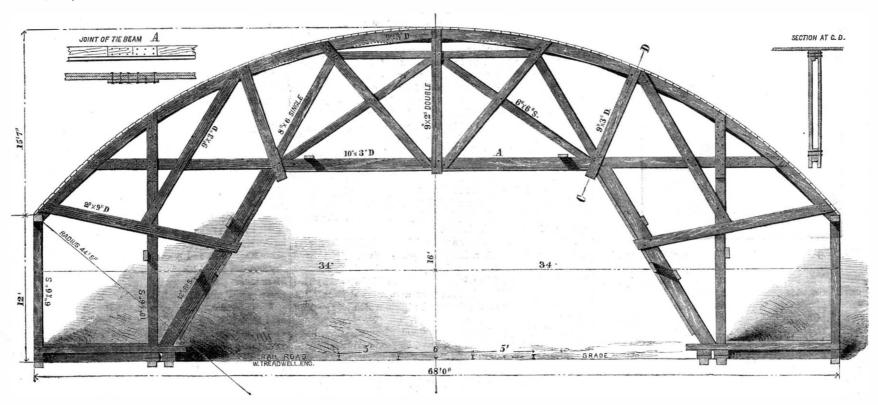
THE UNDERGROUND RAILWAY IN NEW YORK.—CENTERING OF THE GREAT ARCH, FOURTH AVENUE, NEAR 95th STREET.
